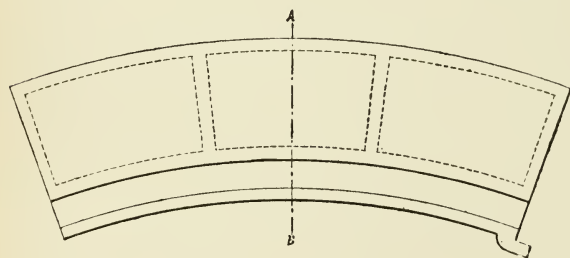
COMBINED WEDGING AND RING CRIB.
